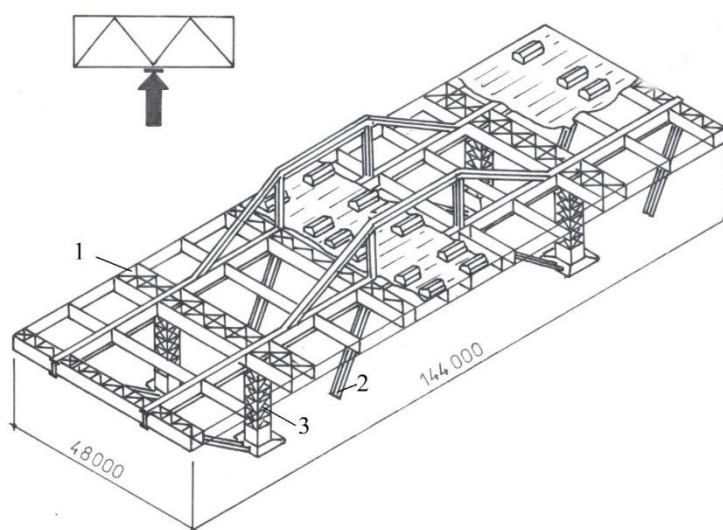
The process of lifting the roof with the relying on the growing mounting columns: 1 – roof, 2 – one-piece project column, 3 – growing mounting column.
